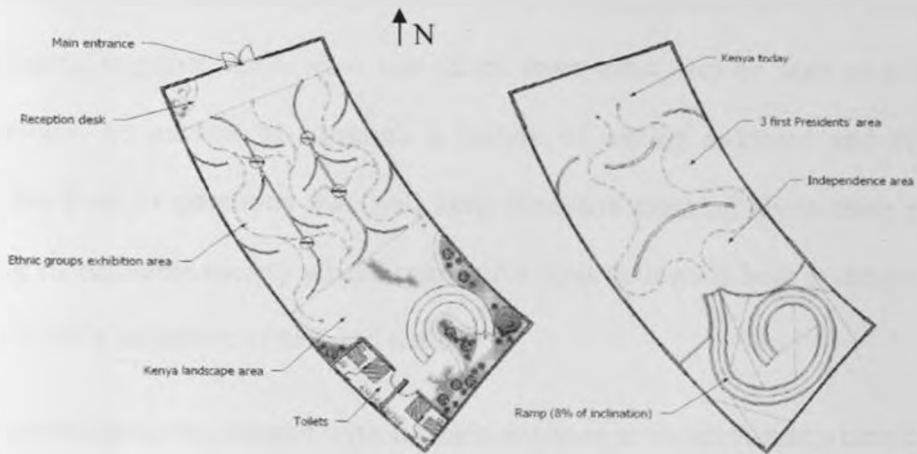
Exhibition building design layout, ground and first floors' plan. Source: Author, 2013.
